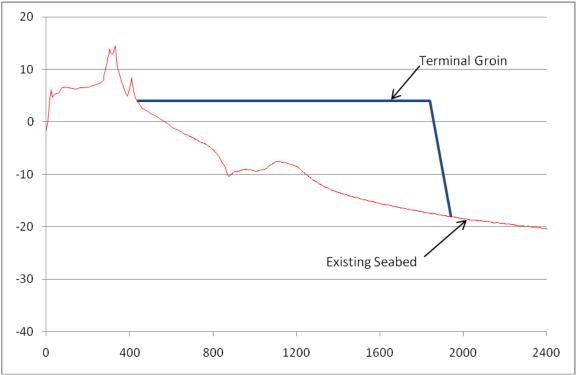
Long Groin Cross Section on a Flat-Sloped Beach
